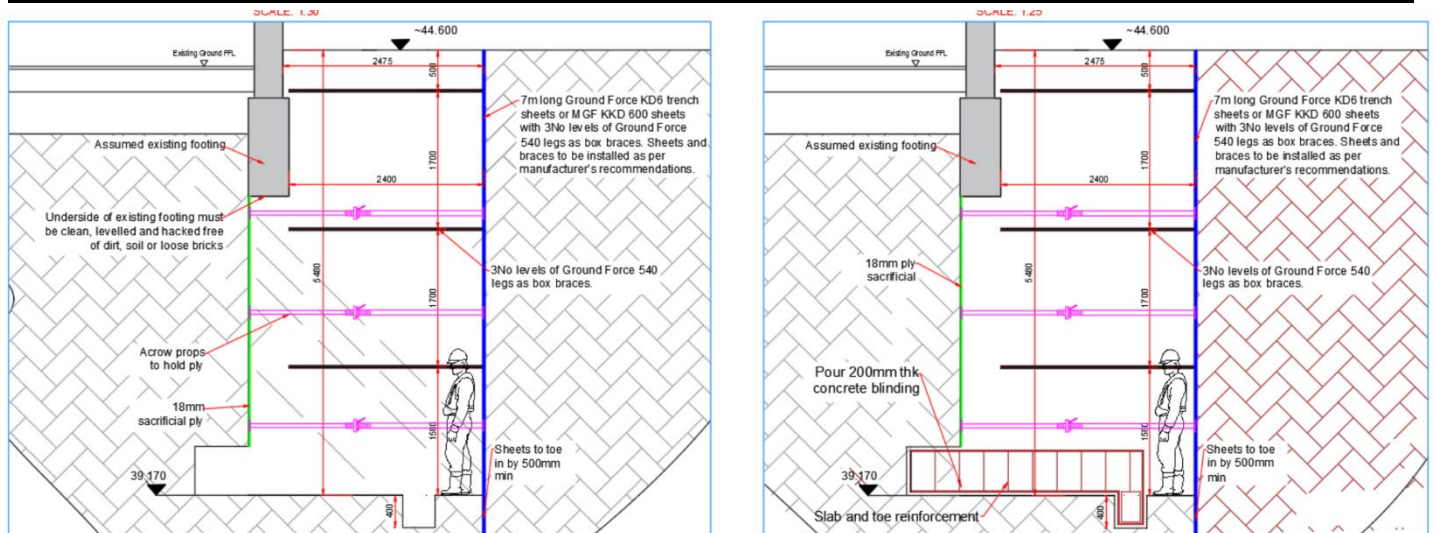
Installation of excavation support (LHS) and formwork for concrete pour (RHS)
